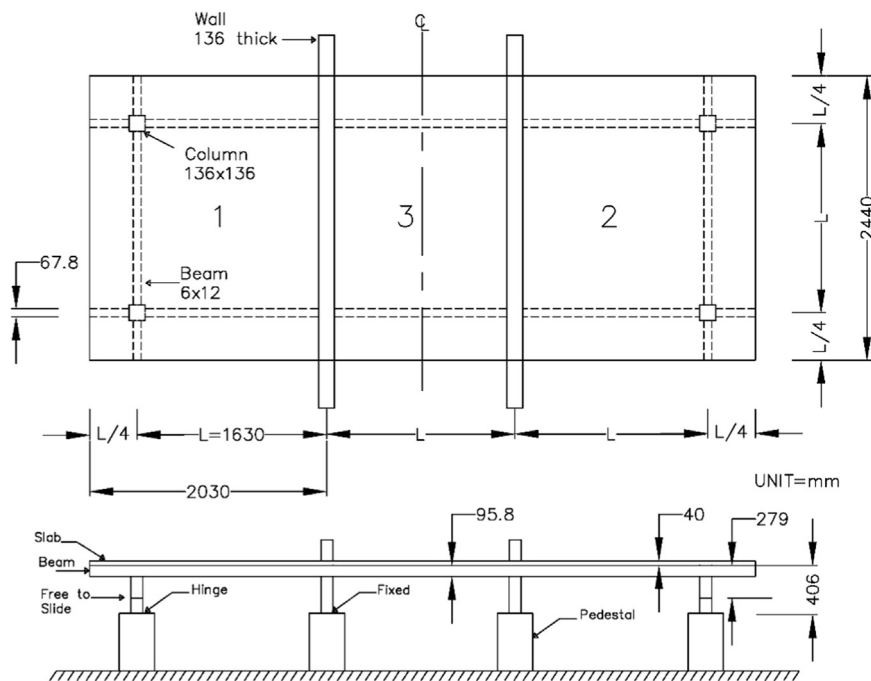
Plan, elevation, and dimensions of the scaled test specimen (shown in mm) [6].
